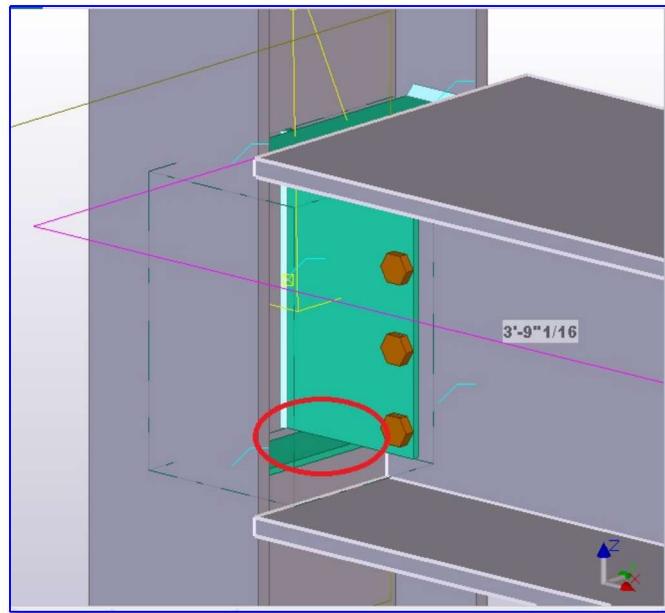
Missing Welds between the Stabilizer Plate and the Single Plate
